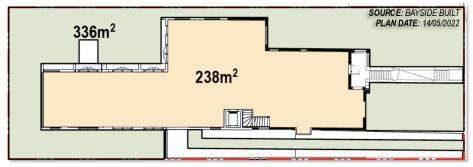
PROPOSED GROUND FLOOR PLAN SHOWING LANDSCAPED AREAS
